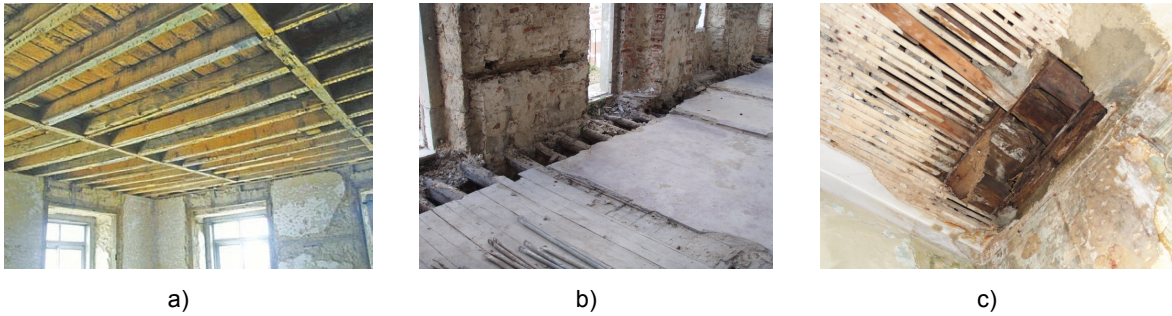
Floor structure: a) Main beams braced on the perpendicular direction (Appleton, 2008); b) Beams embedded on the masonry walls (Appleton, 2008); c) Ceiling finished with laths and plaster.
